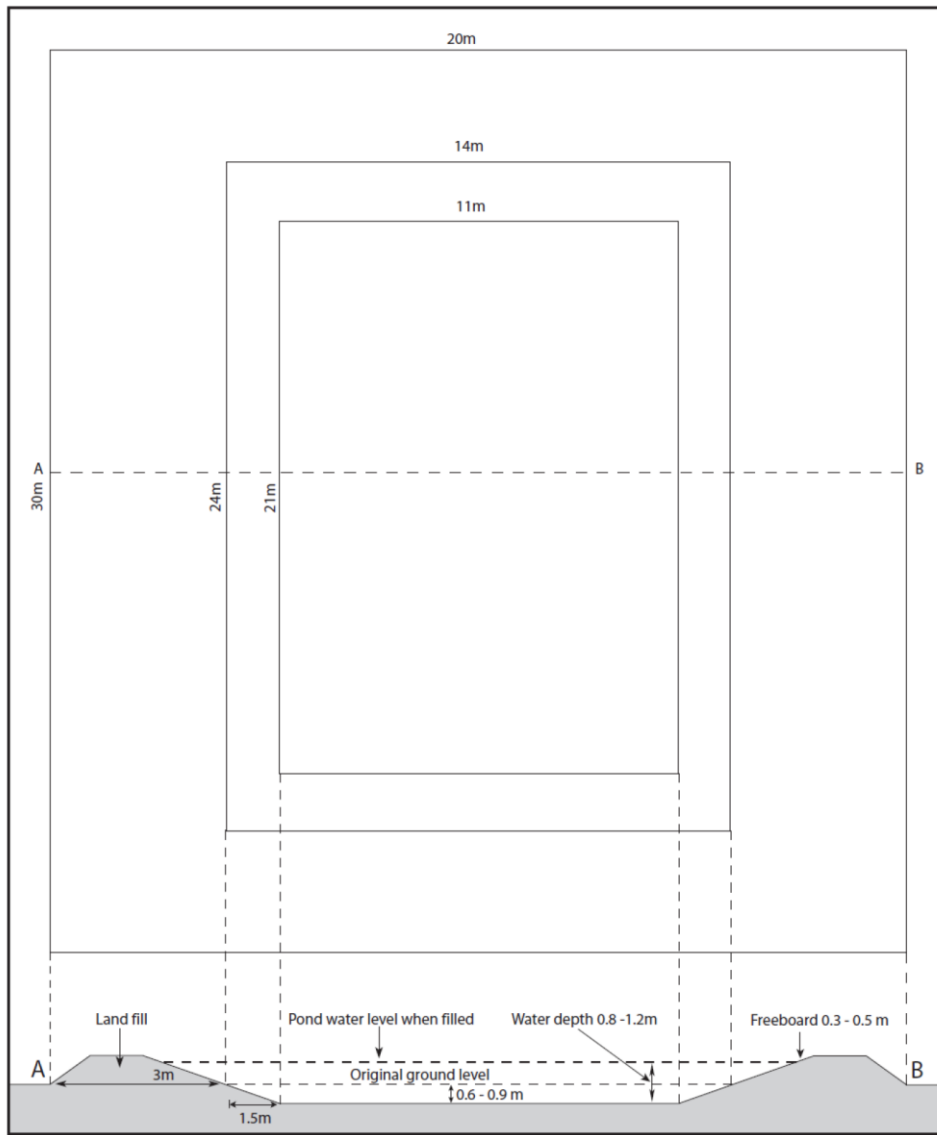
Ground plan for a hand-dug pond (top) and cross-section of pond along A-B (bottom)
